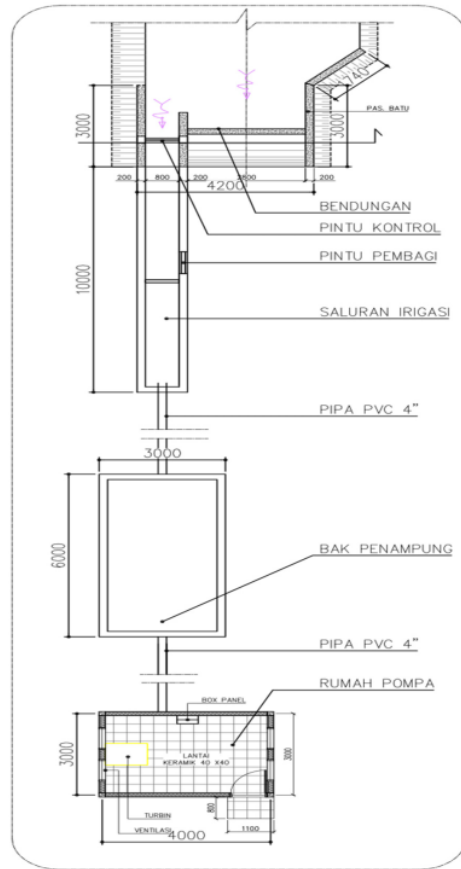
The layout design of civil work for micro hydro plant in Tulaun River at Lalumpe Village.
